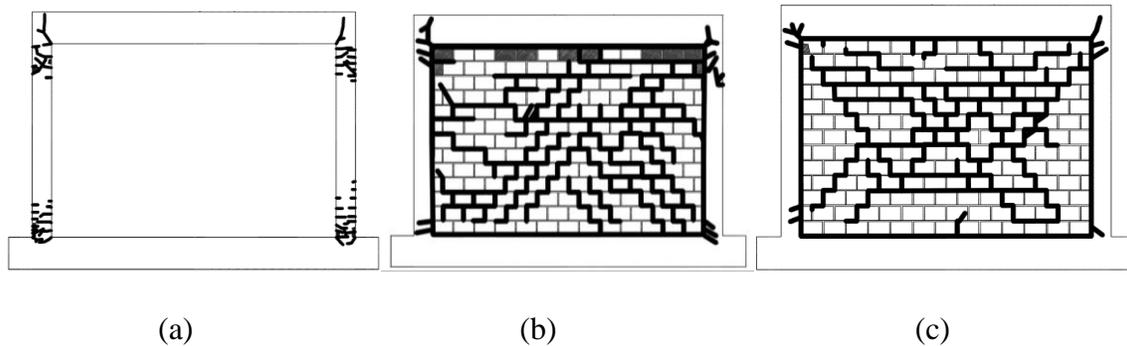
Final cracking pattern of the bare frame; (b) specimen SIF-I-A at end of the test; (c) specimen at lateral drift of 1%;
